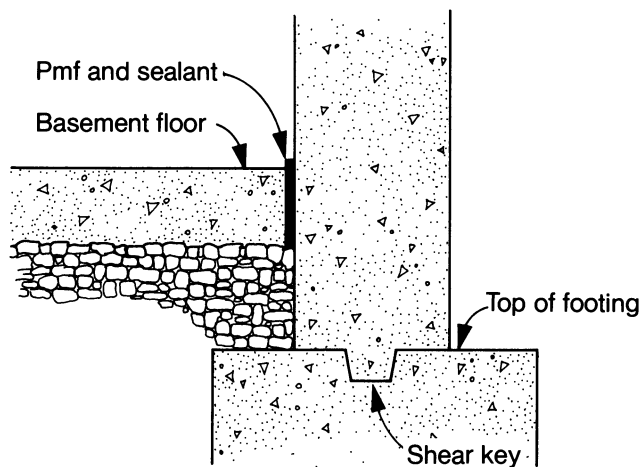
Earth pressure transfer from basement wall to footing.
